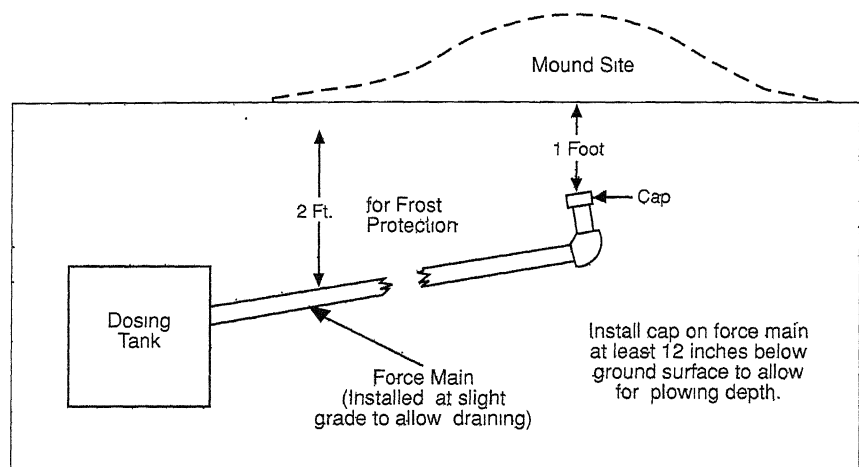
Installation of force main from dosing tank to mound area prior to mound construction.
